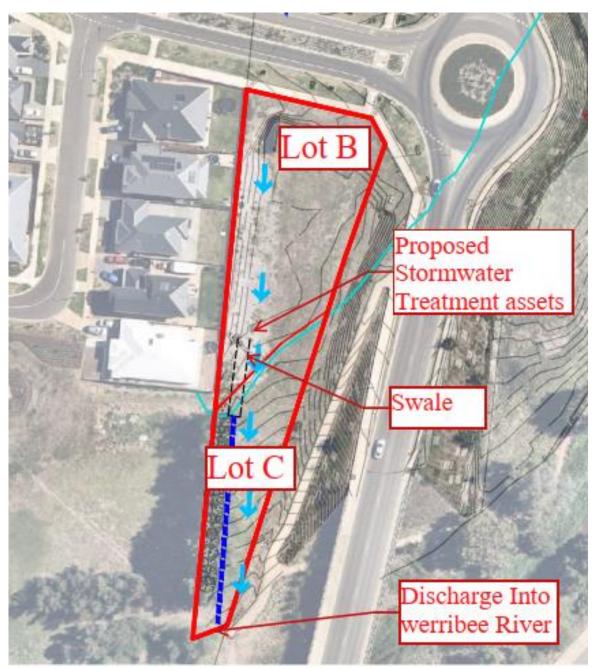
CONCEPT DRAINAGE PLAN LAYOUT HALLETS WAY SOUTH SUBAREA
